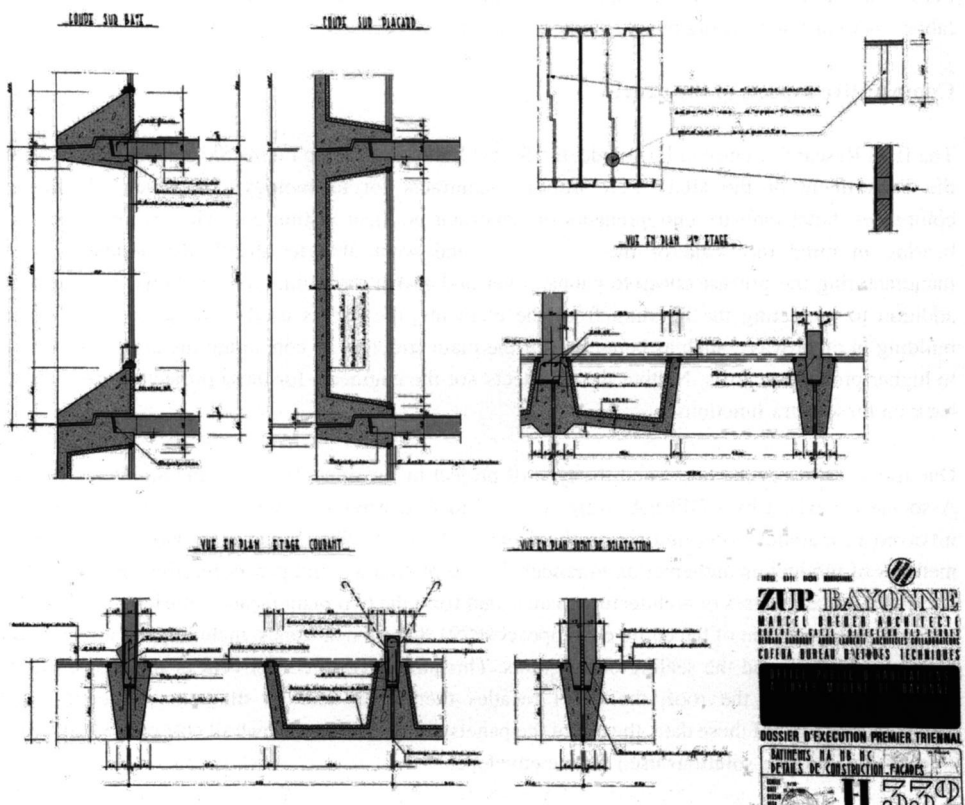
Details of the attachment of the main structure with the precast panels. Source: Archives départementales, Pôle de Bayonne et du Pays Basque.
